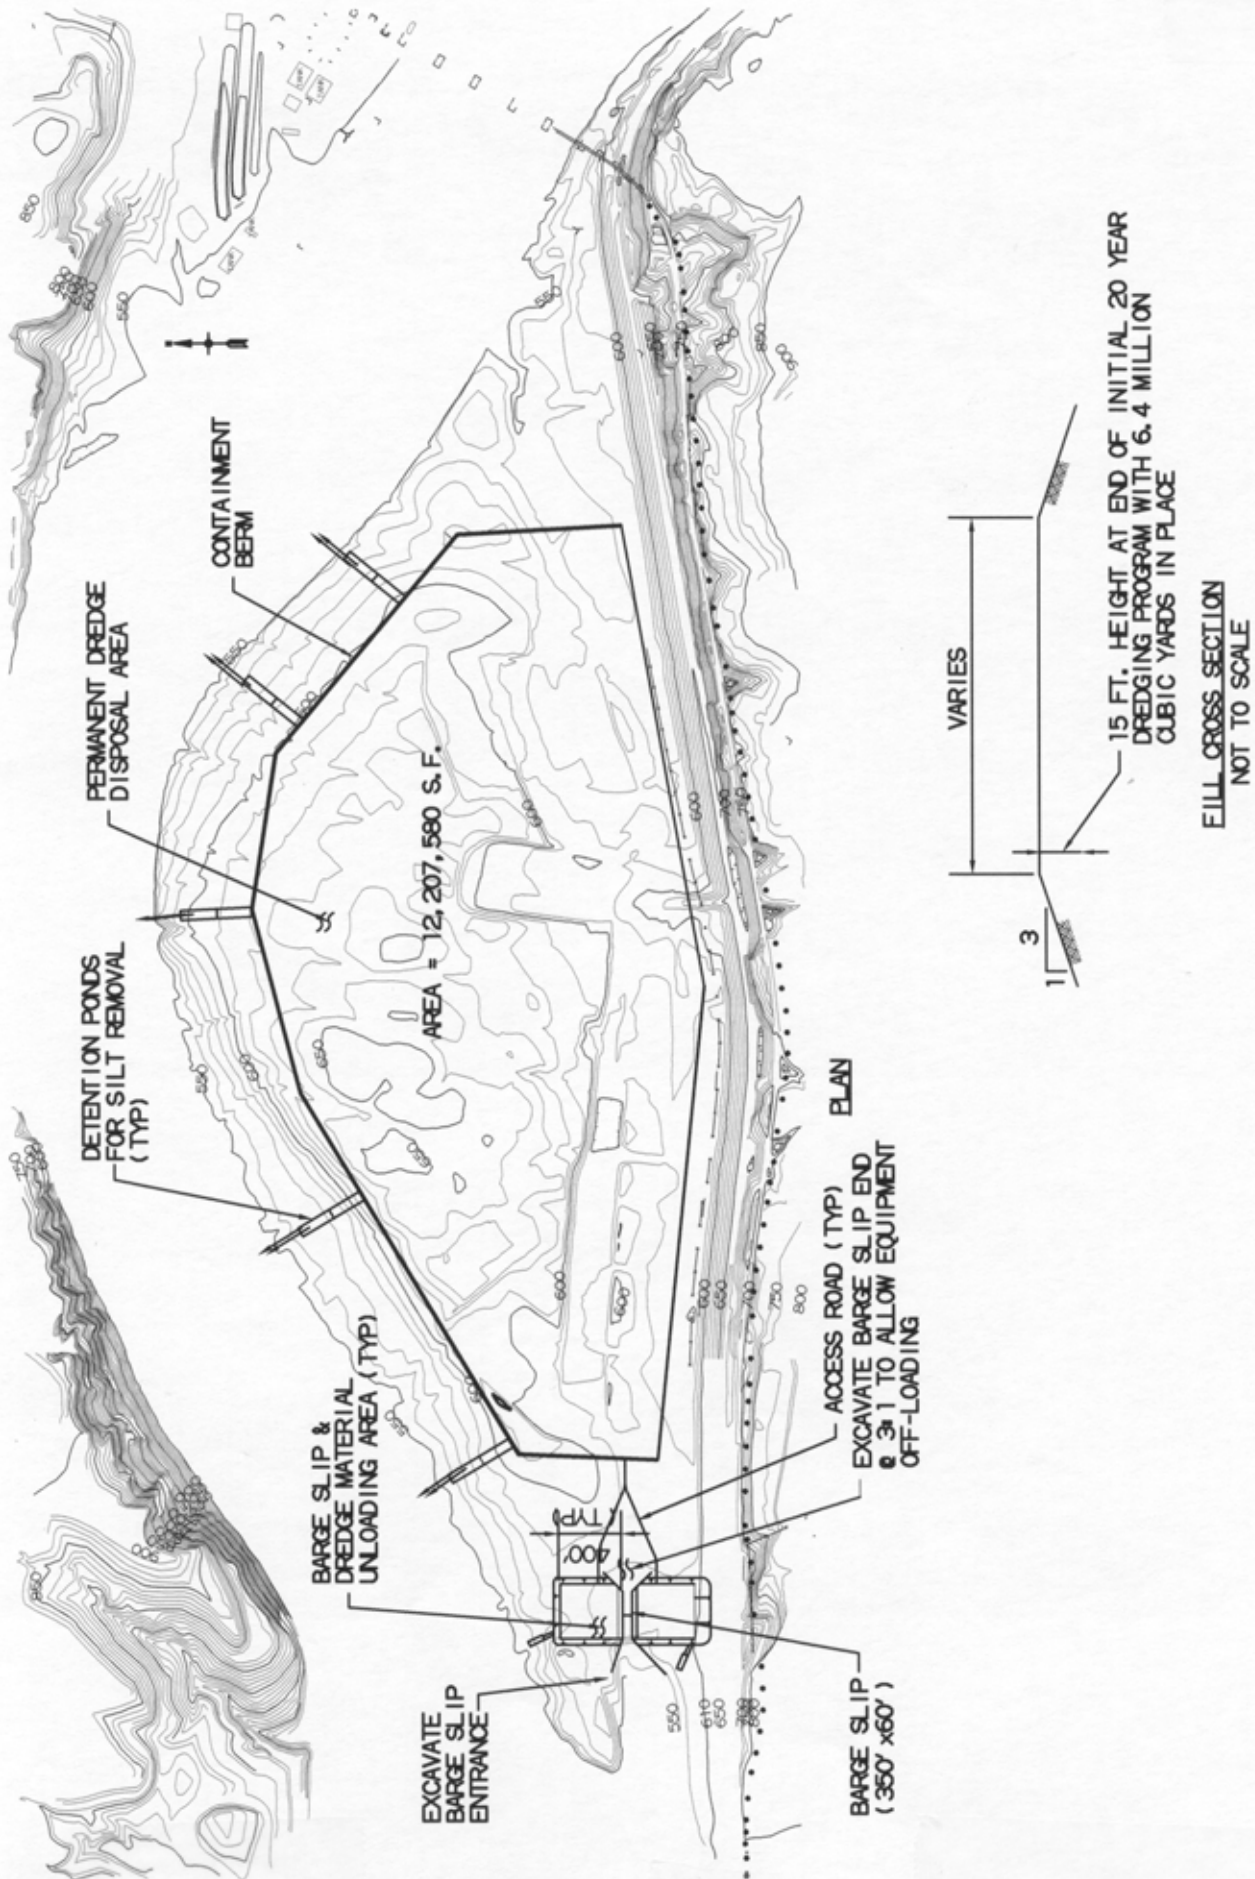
, JOSO DREDGED MATERIAL DISPOSAL SITE
